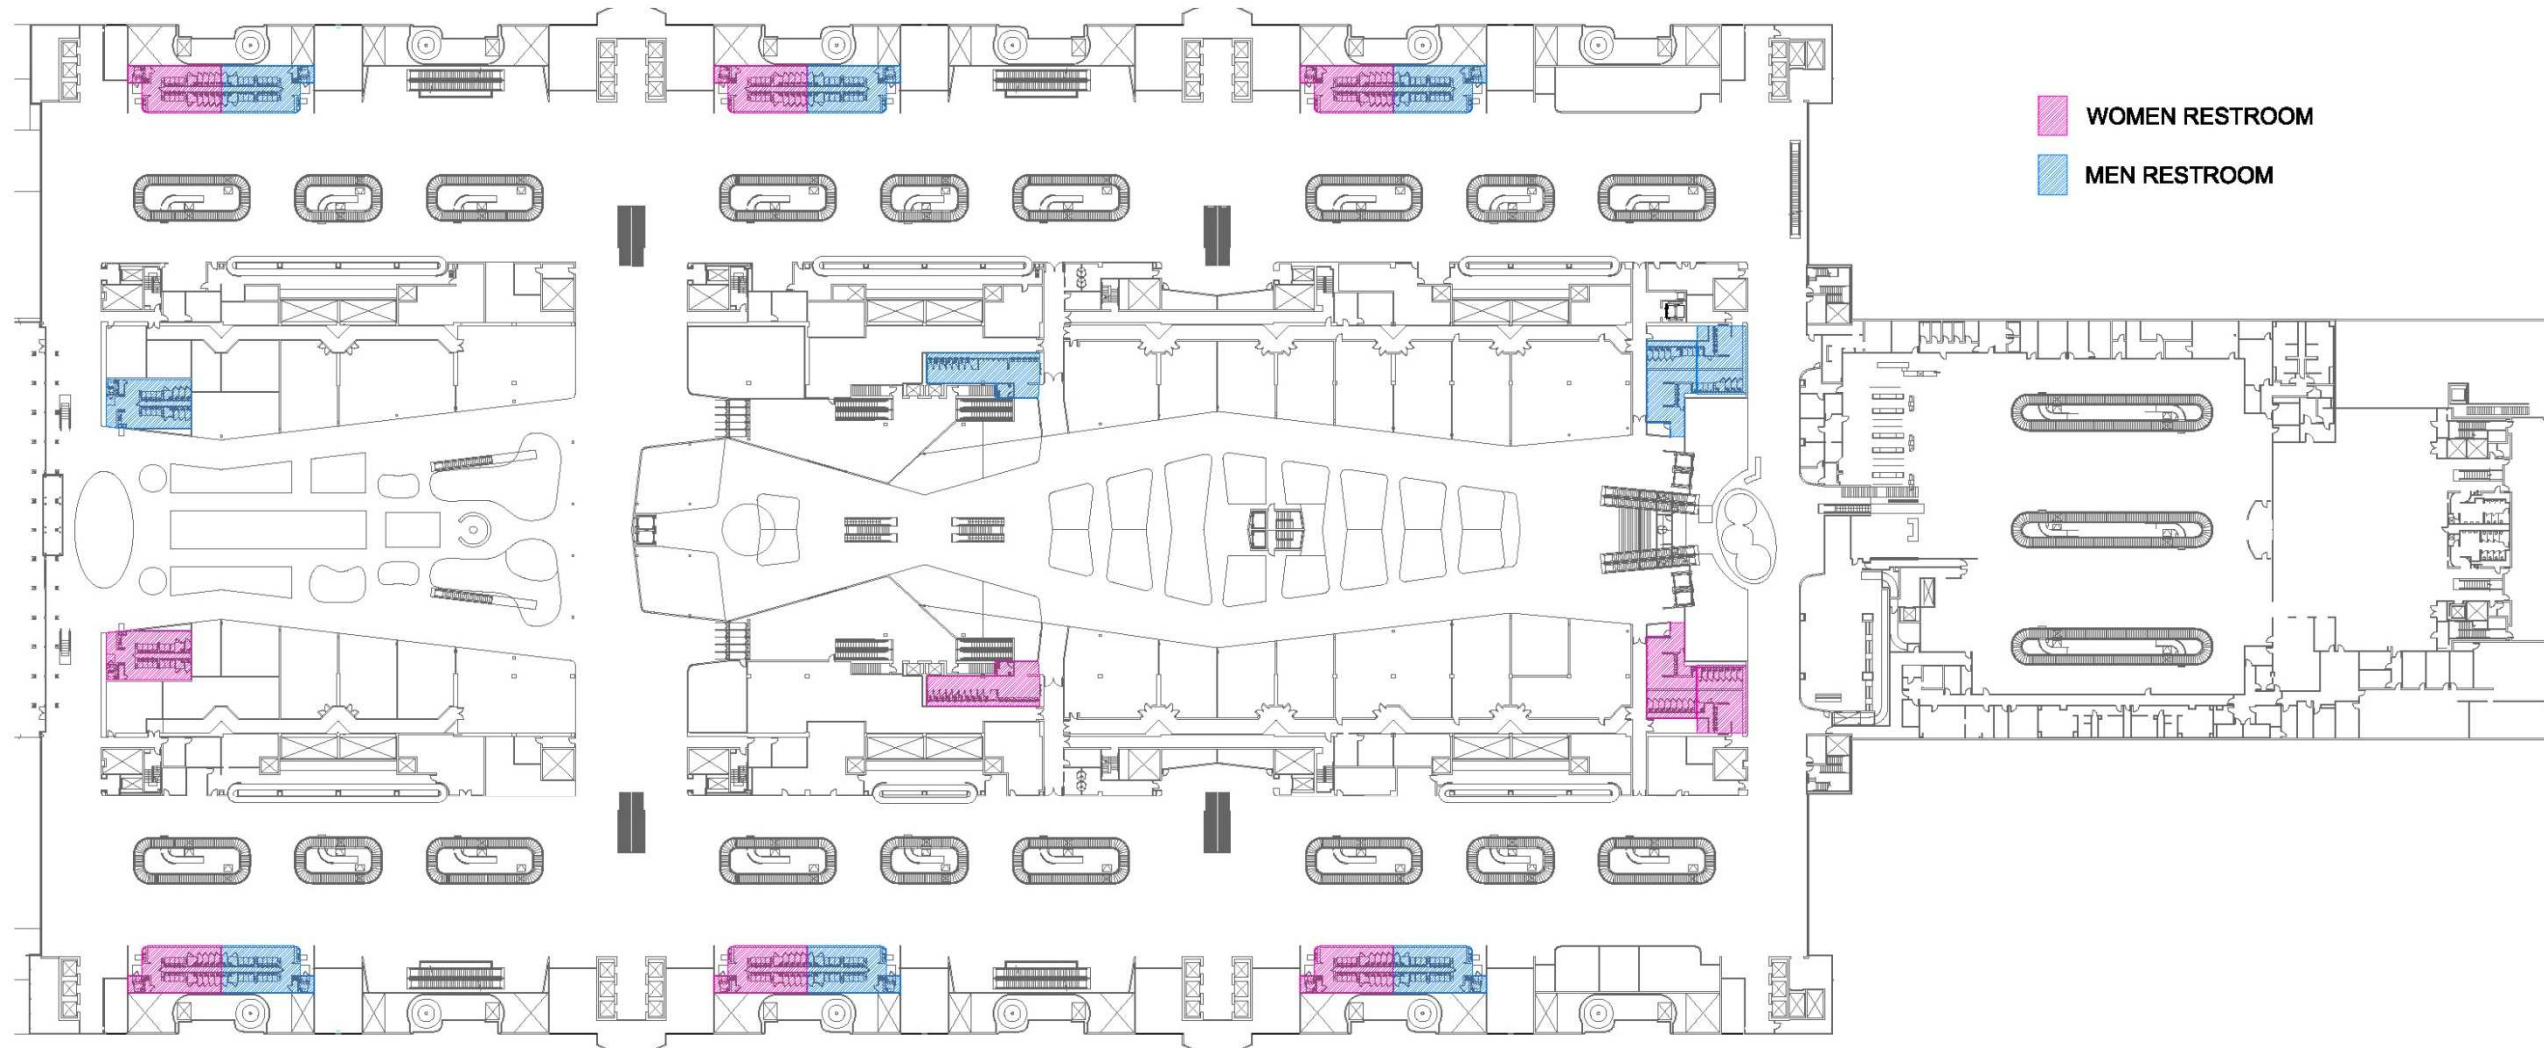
(b) – Level 5 Restroom Facilities
